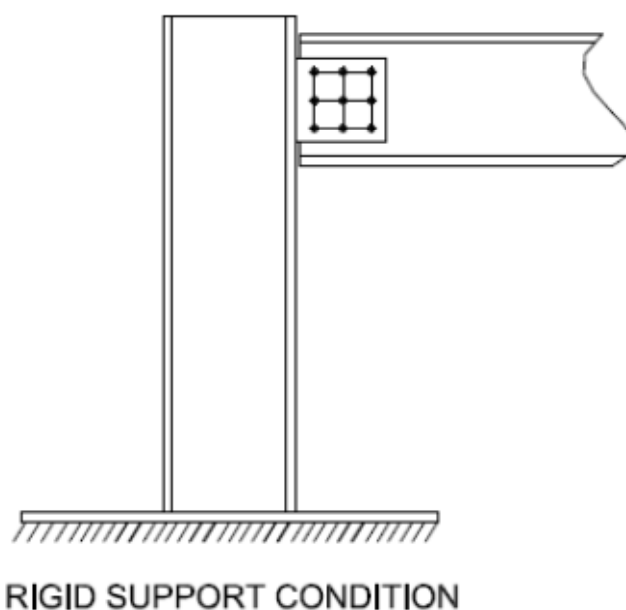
Beam to Column Flange Shear Tab Connection
